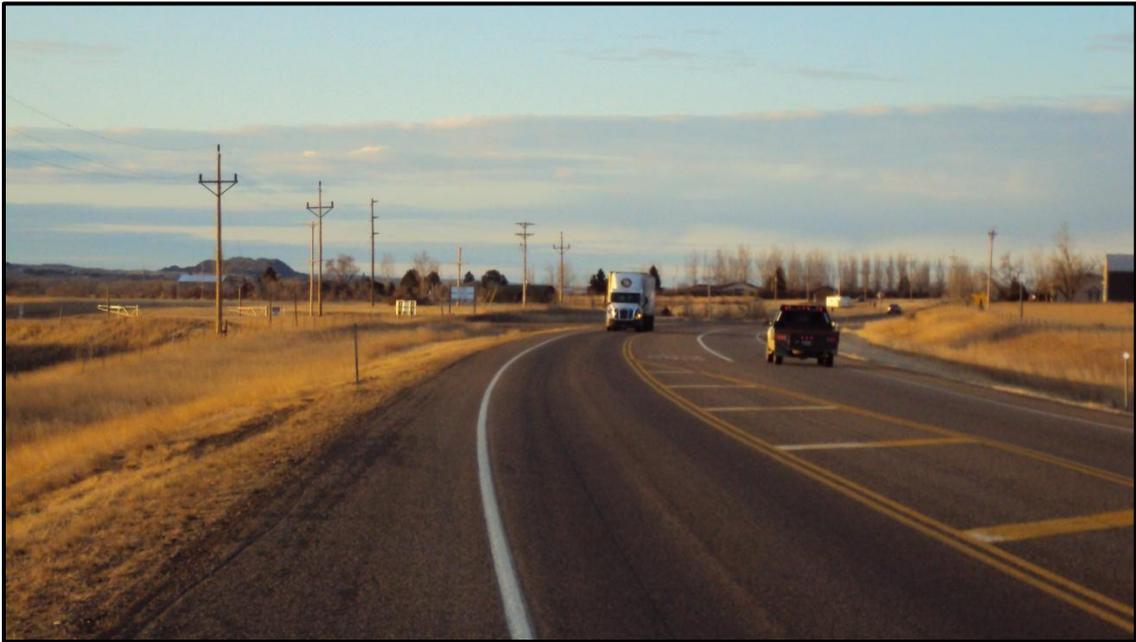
Looking west at a box culvert/wildlife underpass under MT 16. East side slope transitions from 4:1 to 2:1 approximately 18 feet from northbound travel lane. RP 2.4.
